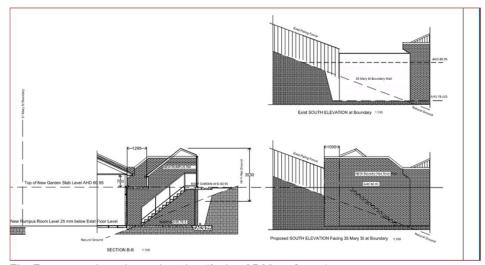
proposed southern elevation (facing 35 Mary Street)
